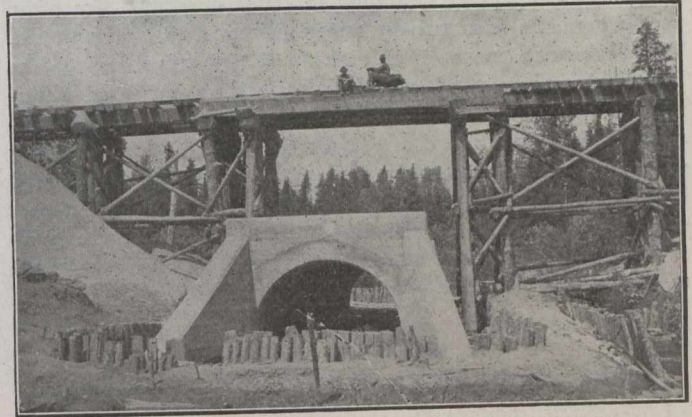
Typical Railroad Culvert in Earlier Stage of Construction.
